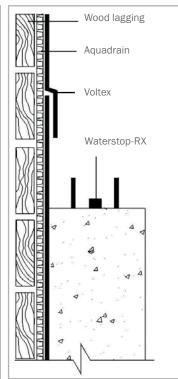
Aquadrain used to cover gaps in lagging less than 2.5" (63 mm). (Cast-in-place concrete wall)
